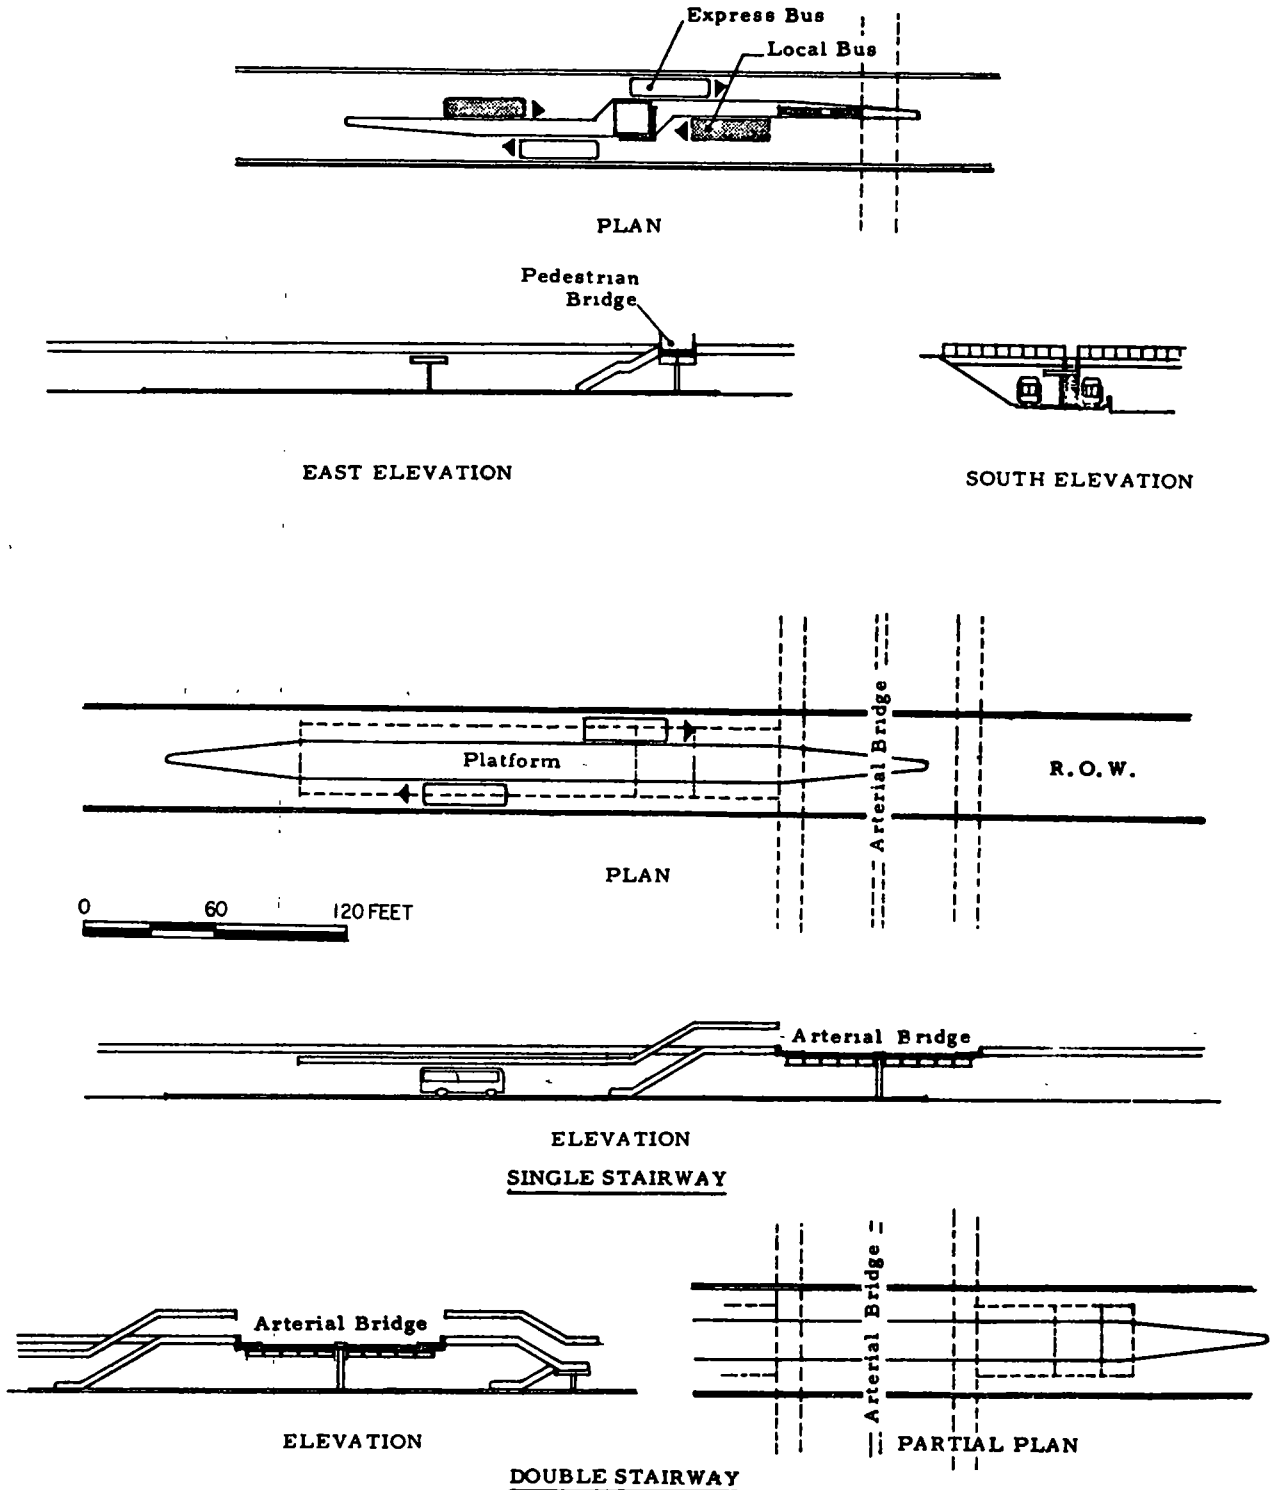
Typical station designs, Crosstown Busway, Chicago, Ill.
